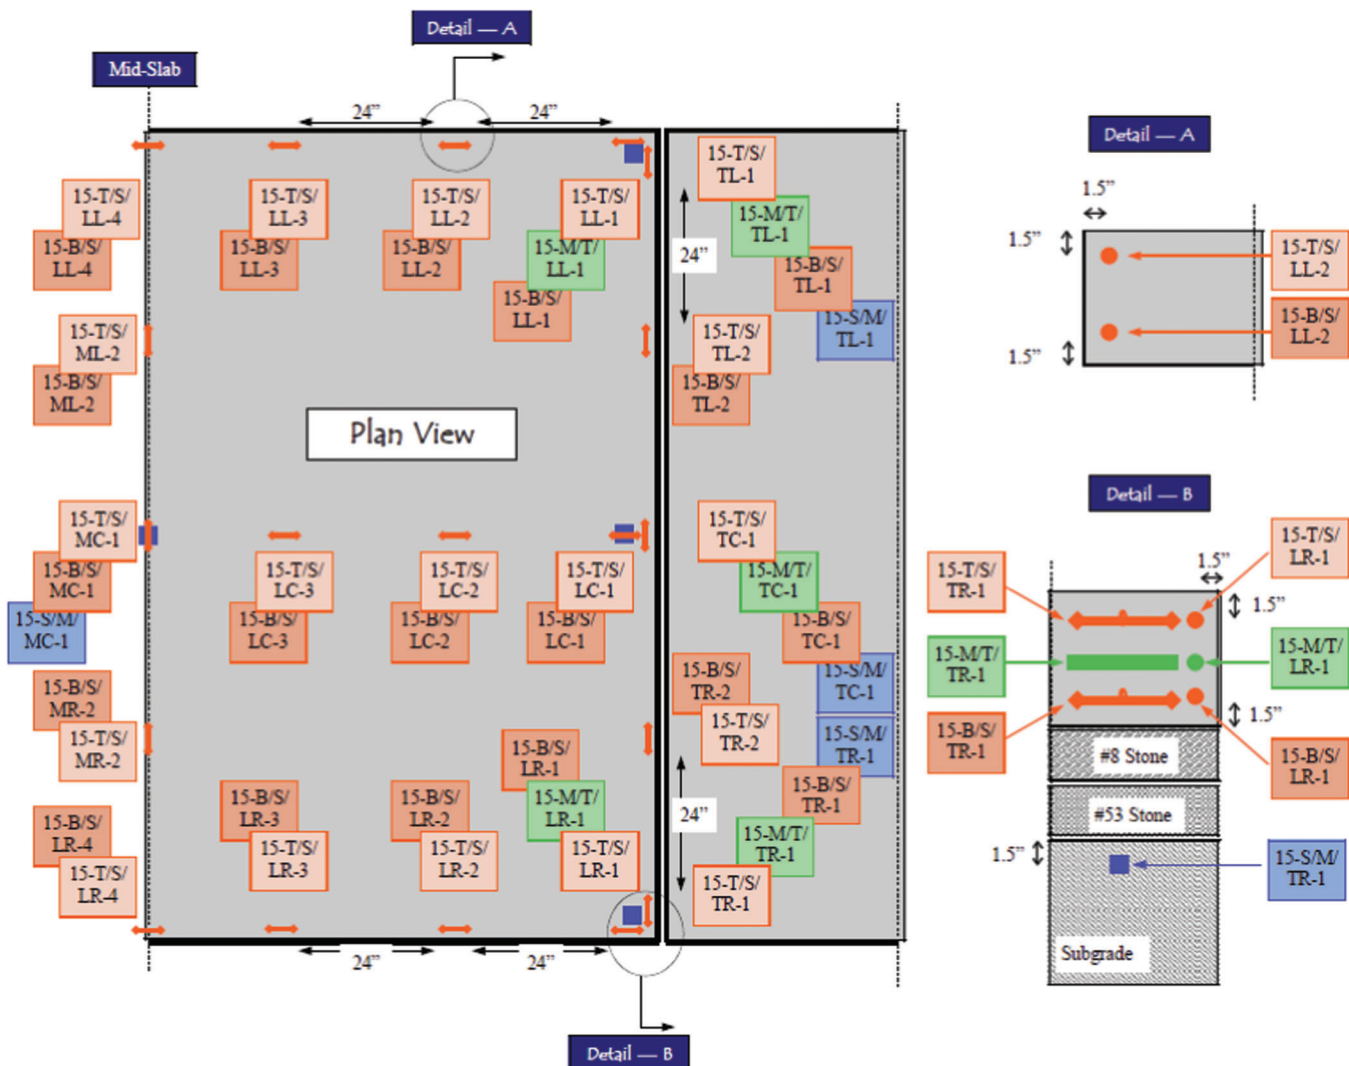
Instrumentation for Slab A, south section (15 inches thick with 15-foot joint spacing)
